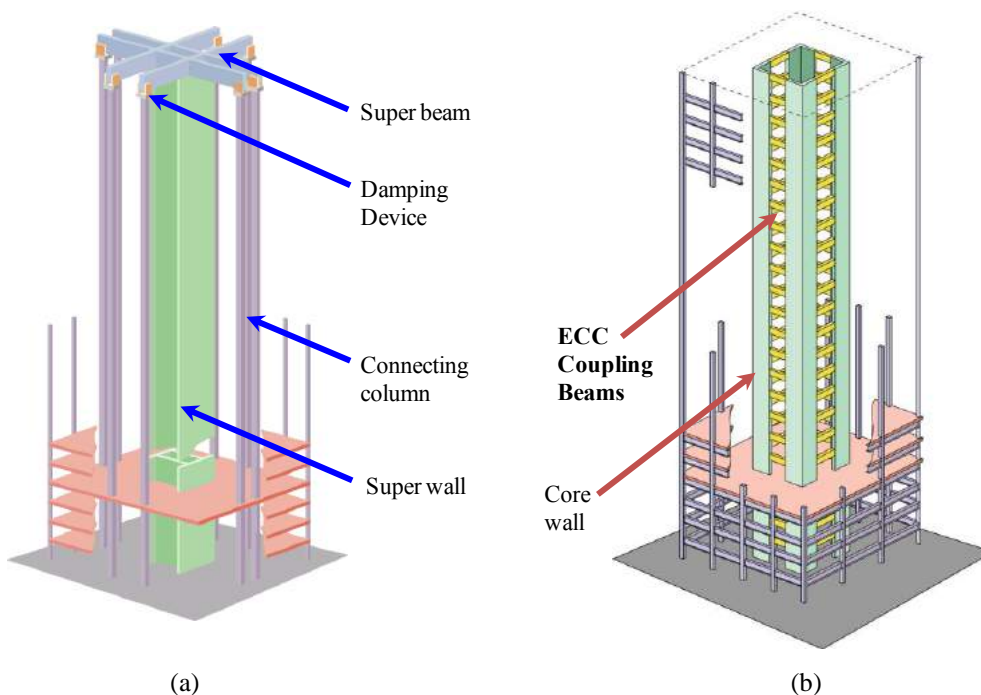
(a) Superframe design, and (b) ECC-coupling beam design of tall buildings realized by Kajima Corporation (Kanda et al., 2011)
